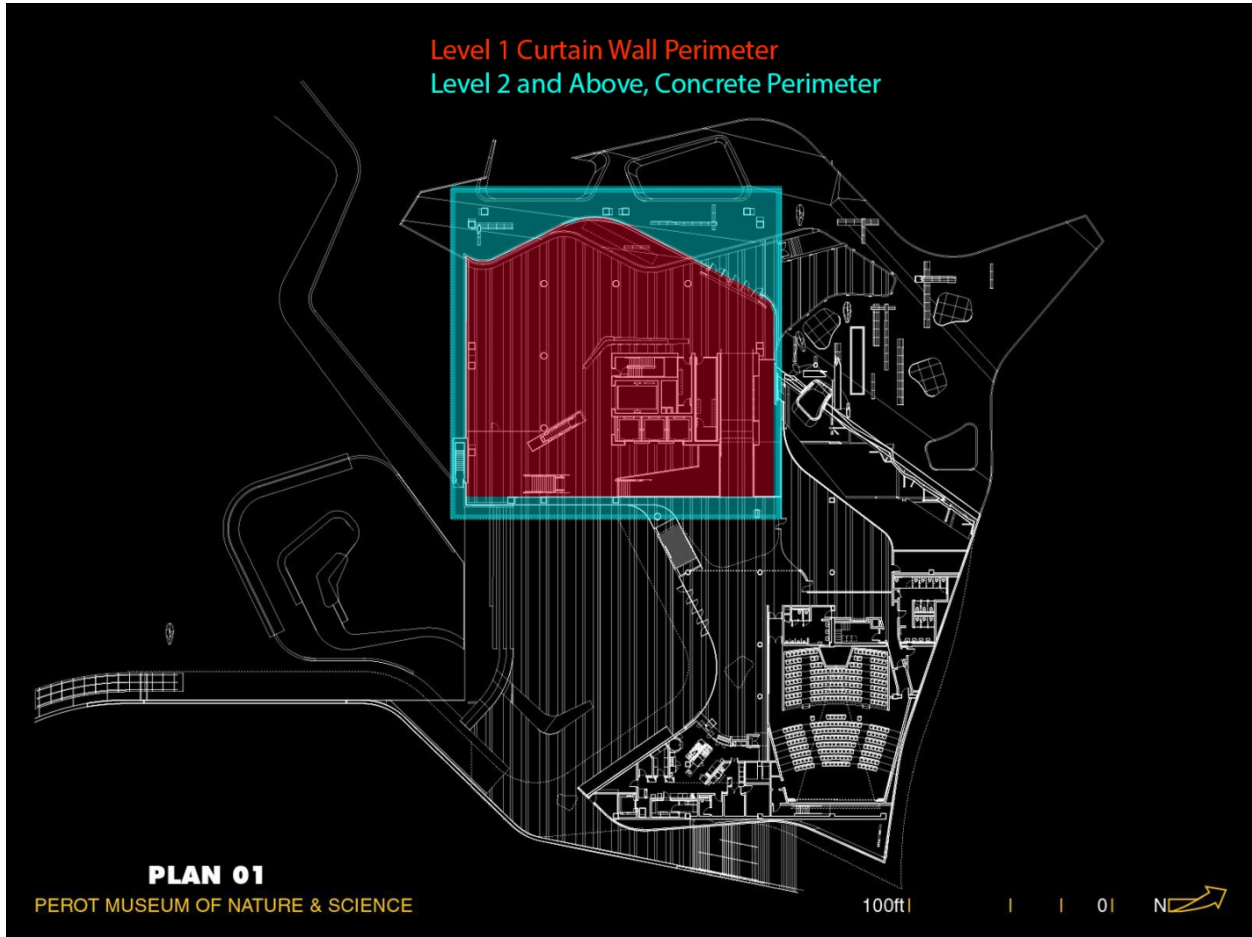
, Ground Level Floor Plan - Building Perimeter Diagram
